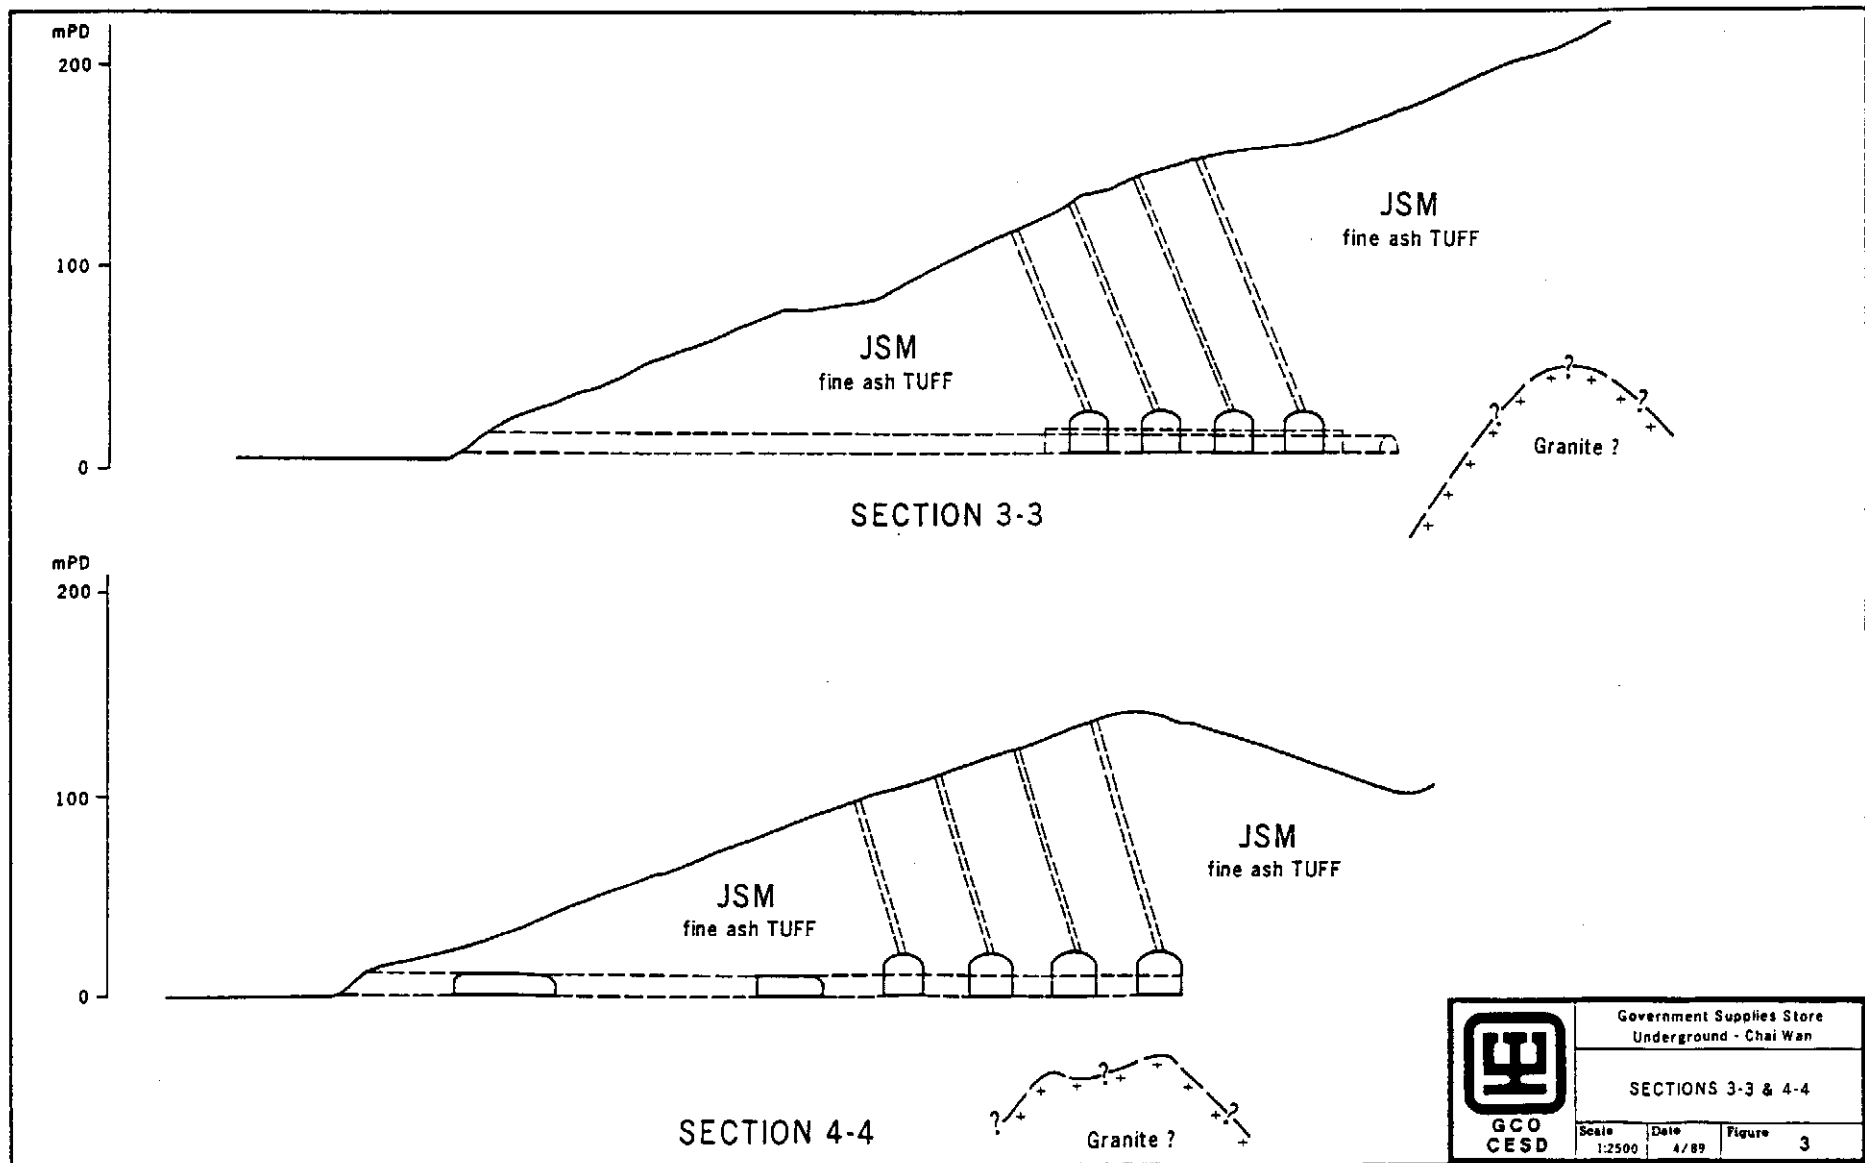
Cross-section - Proposed Chai Wan Underground Facilities
